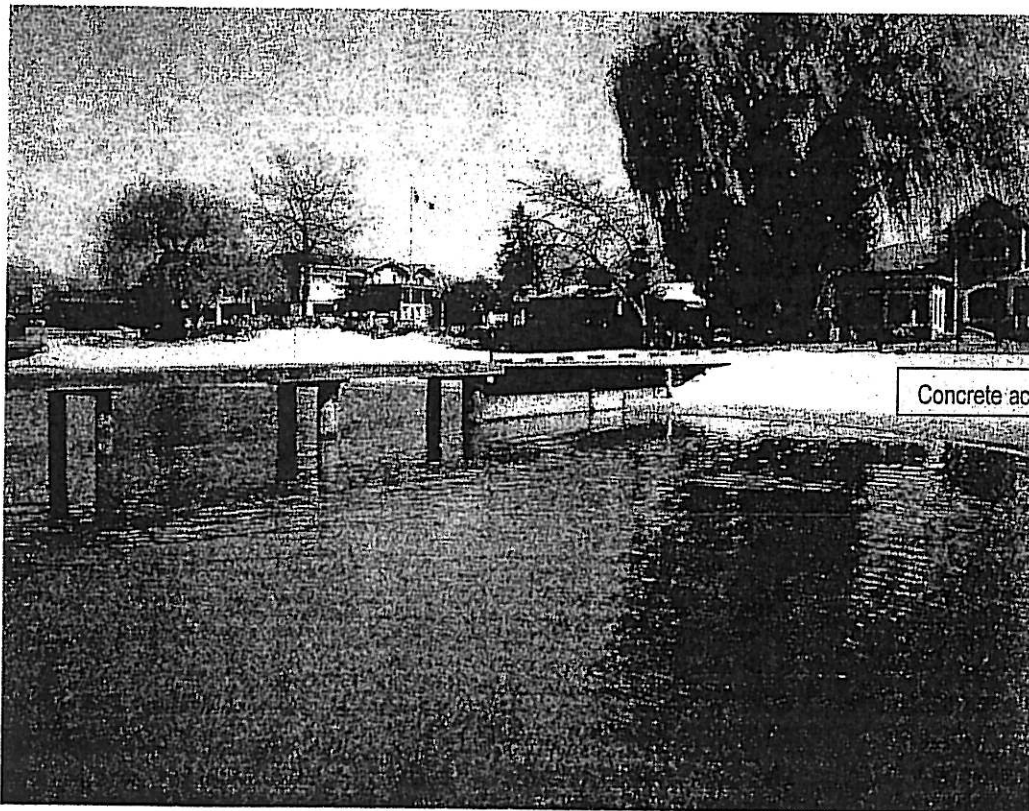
Looking north towards the existing dock and concrete access ramp which extends approximately 26.4 m from the fenced yard of the subject property to the wooden decking. A concrete wall supports the access ramp and occurs within Okanagan Lake.
